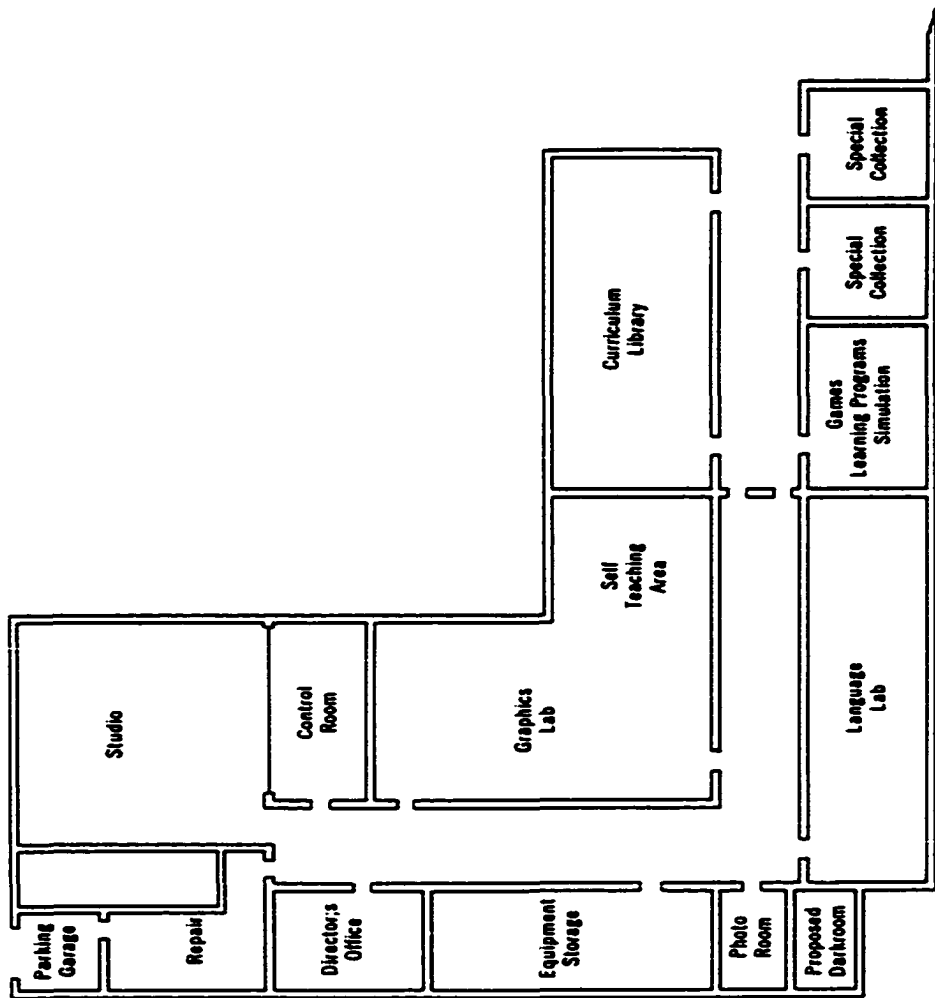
Floor Plan of Calvin College's Audio Visual Center, television studio, and curriculum library.
